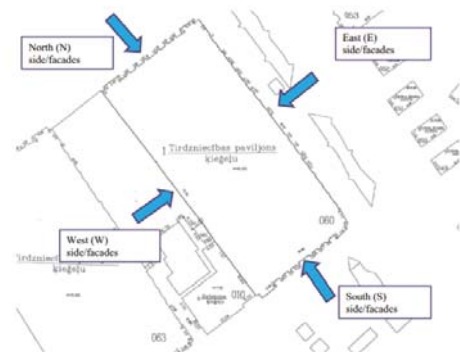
Site plan of the Dairy Pavilion showing the north, east, south, and west facades (Māris Strazdiņš 2024)
